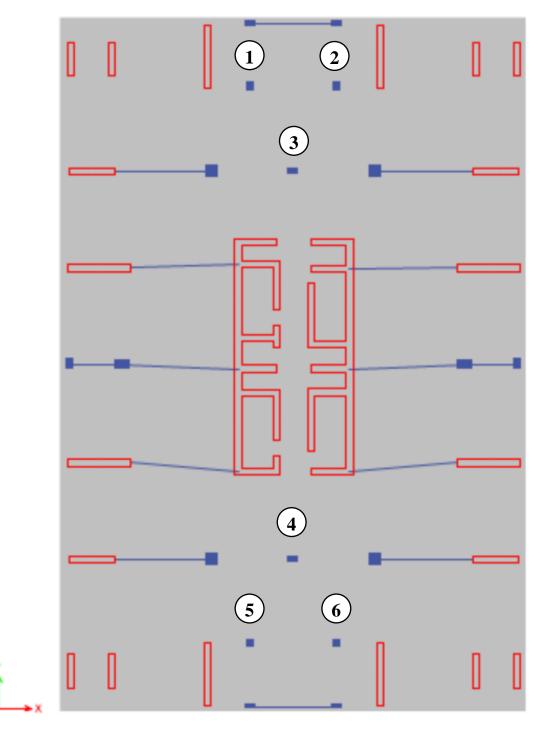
Final residential floor plan (Sample: 40th residential floor)
